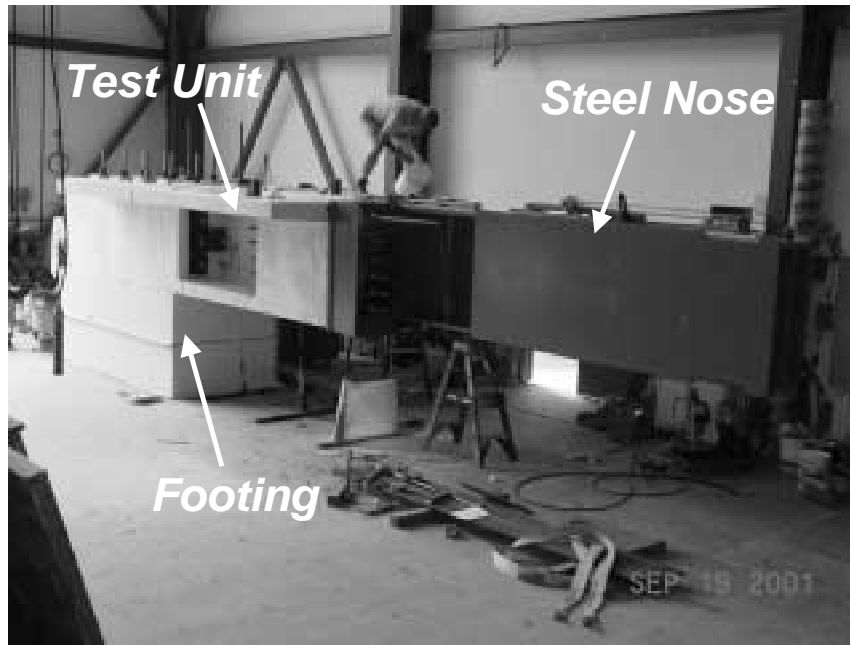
One of the test units with the steel loading beam (steel nose)
